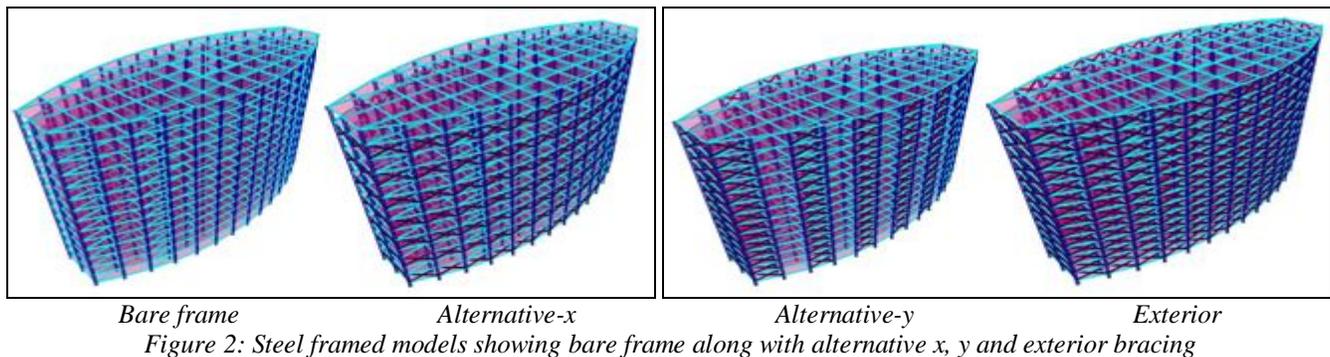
Steel framed models showing bare frame along with alternative x, y and exterior bracing
